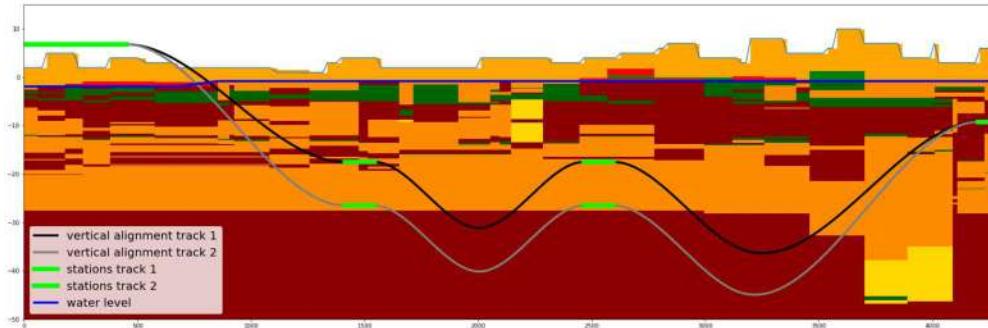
Underground soil profile where the tunnel will be (Hydraulic discipline)
